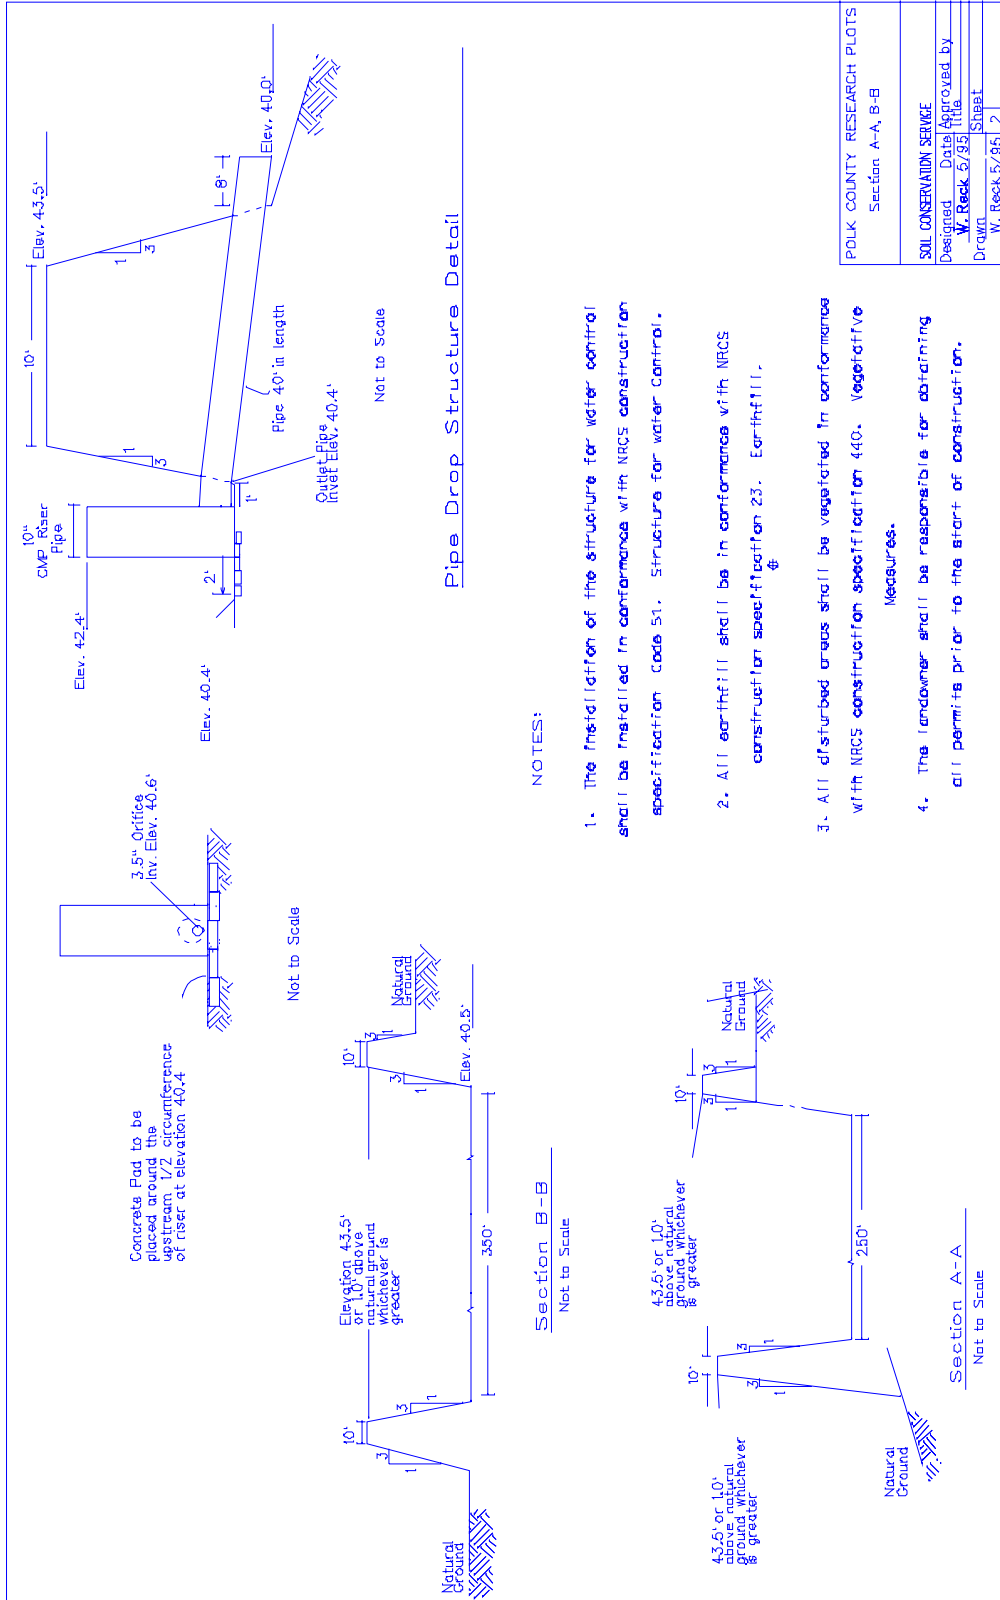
Construction Details for Outlet Structure from the Pond, Ft. Green Site.
